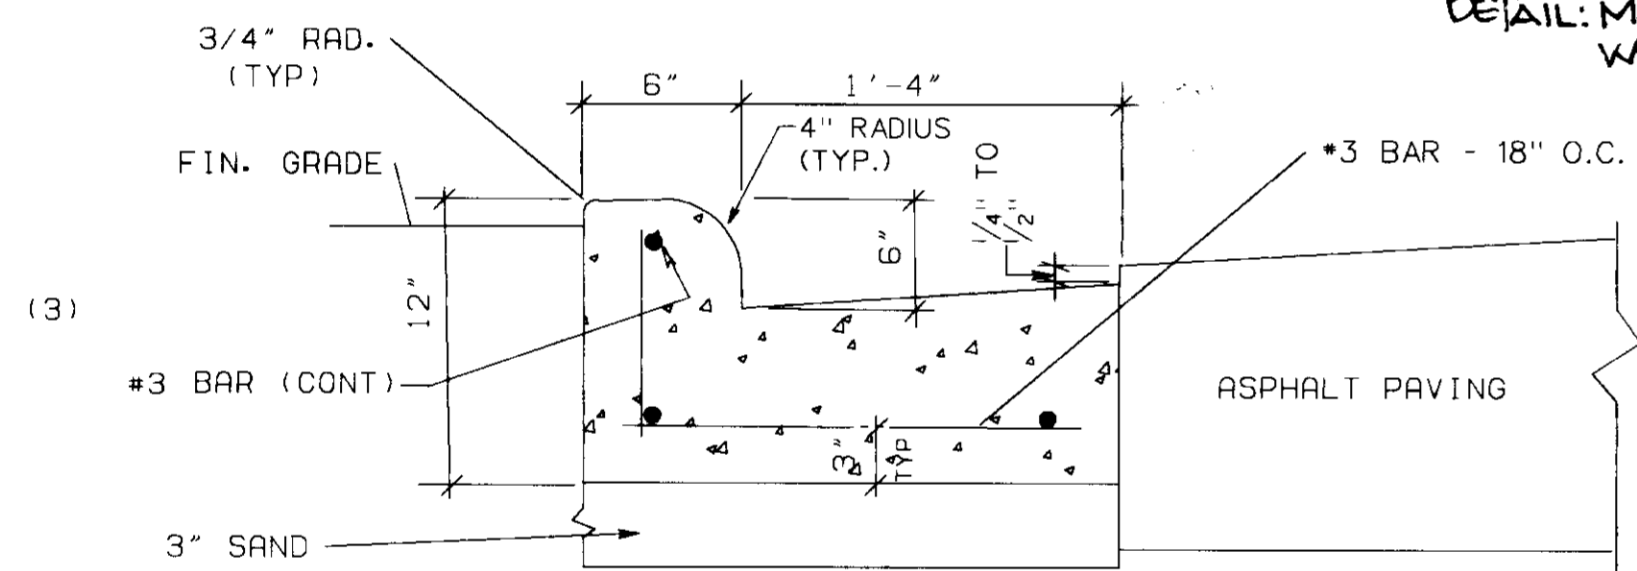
DETAIL: MONOLITHIC CONCRETE ROLLER CURB
